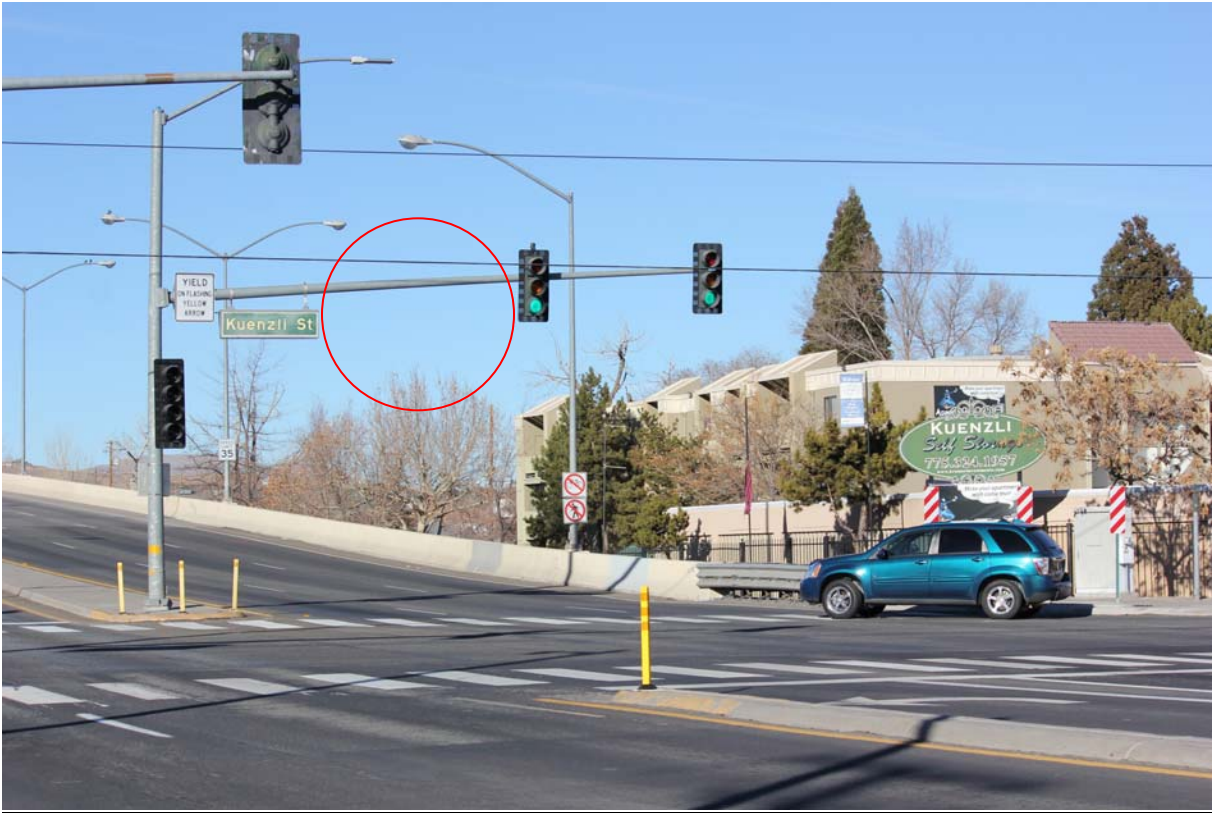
looking northbound on Wells Avenue at the intersection of Kuenzli Street.
